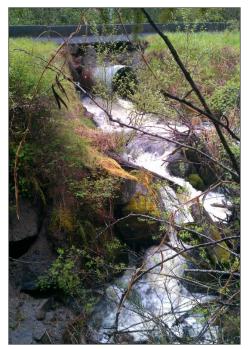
SR 504 Wooster Creek CED, April 2014. The failing culvert had developed a 10-foot cascading elevation drop downstream of the pipe.
